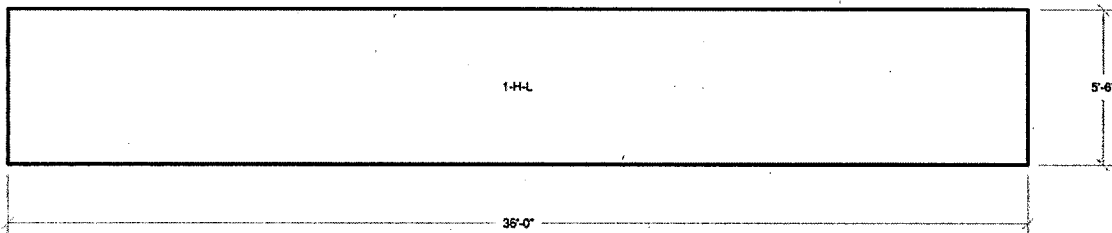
H.7-18. Roof of Tunnel Looking Down Horizontal Reinforcement Zones Near Side and Far Side Faces
